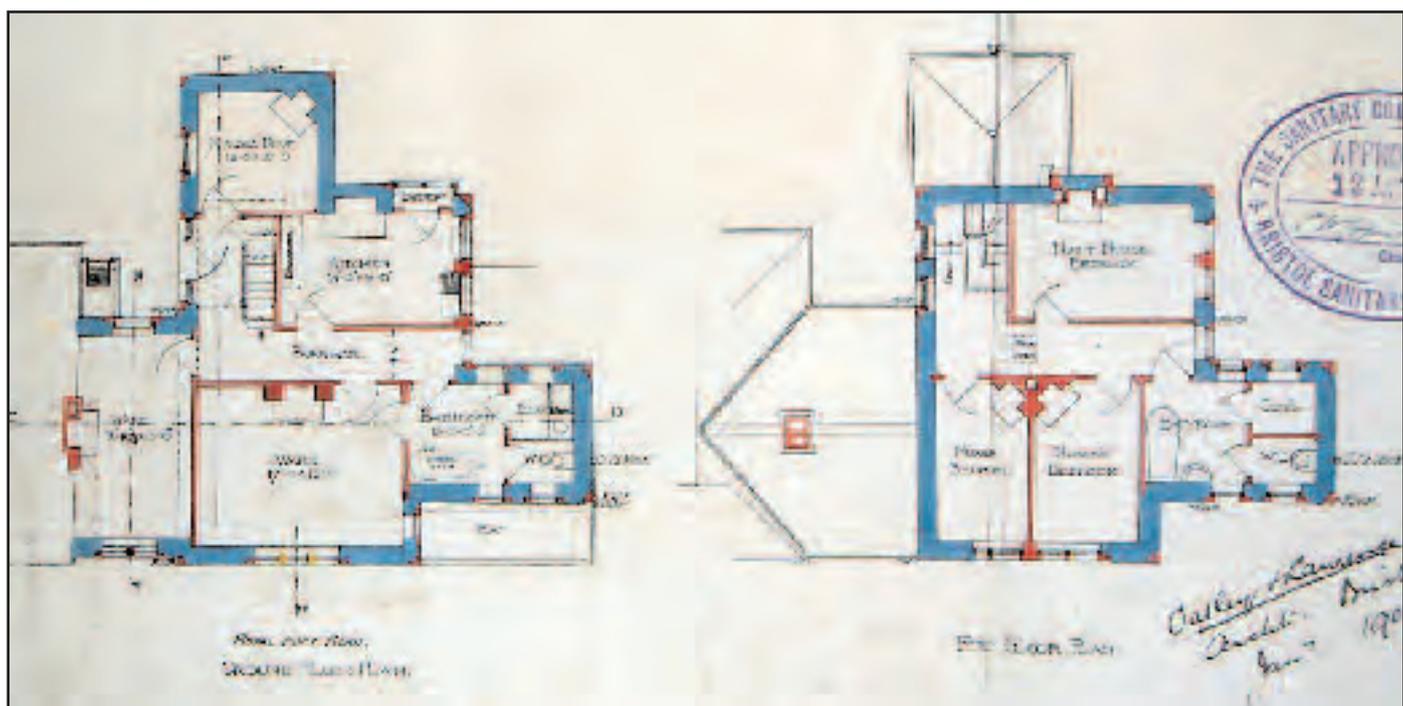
Children's Hospital, Royal Fort Road - floor plans, 1905
